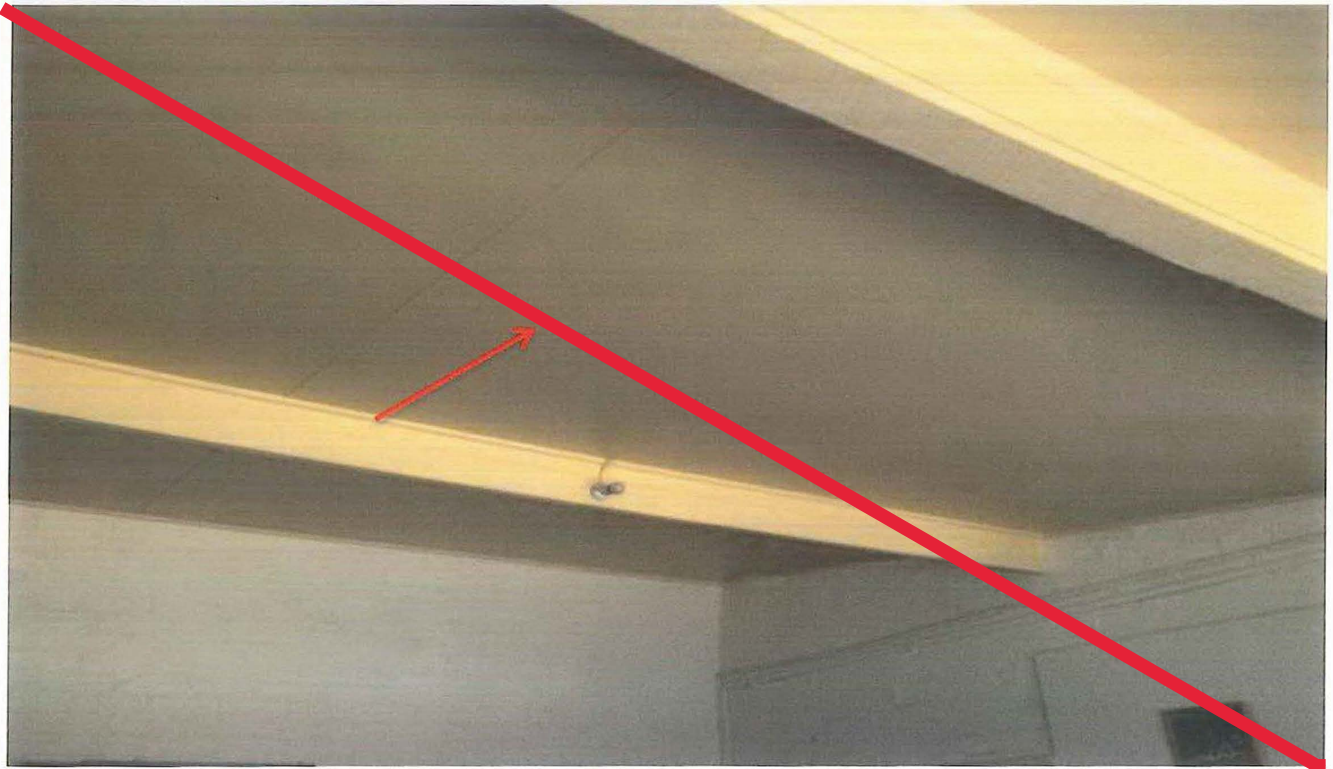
Asset D00153 – Jubilee Park, Blackheath – Tennis Clubhouse – kitchen – fibreboard ceiling lining containing asbestos.
